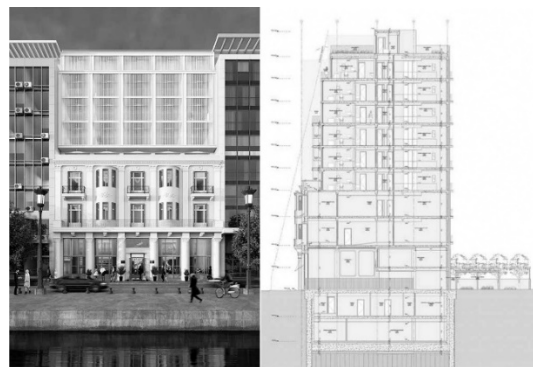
Left: Rendering of the final proposal for the building. Right: Building section.
